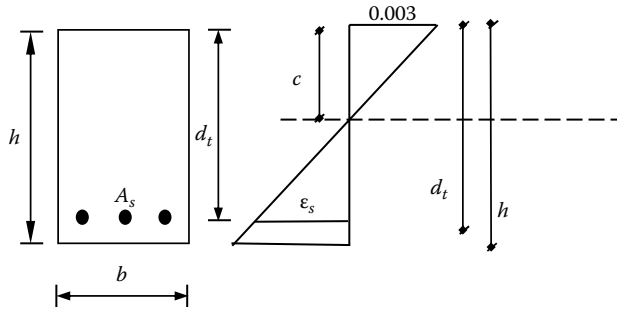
Typical rectangular section and strain profile at section failure.
